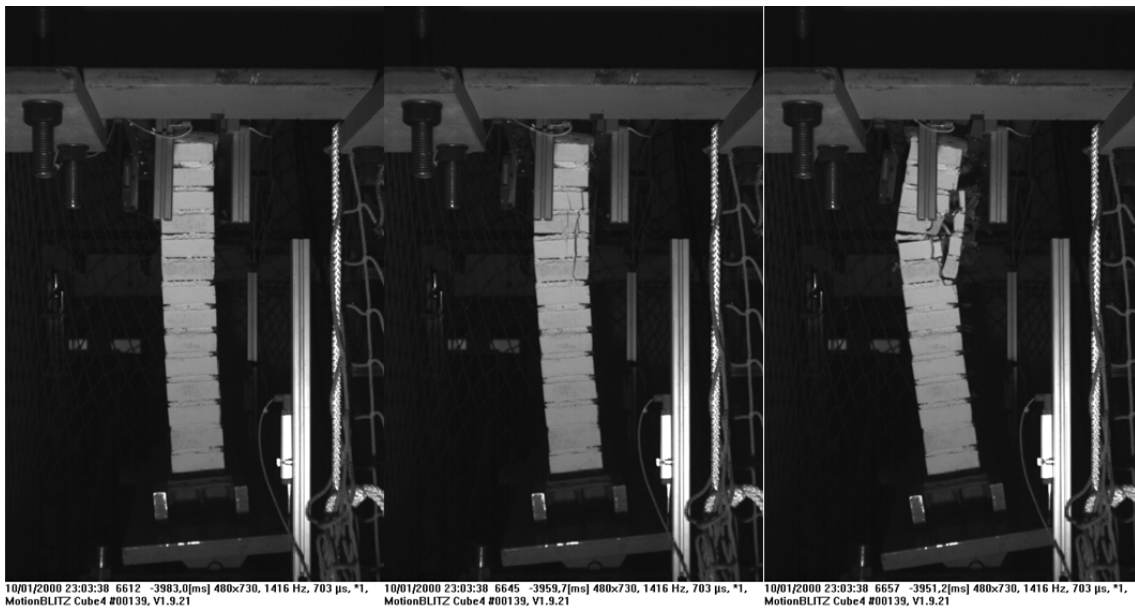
182 Failure of the wall W#18. Crushing of the masonry near the wall's top.
